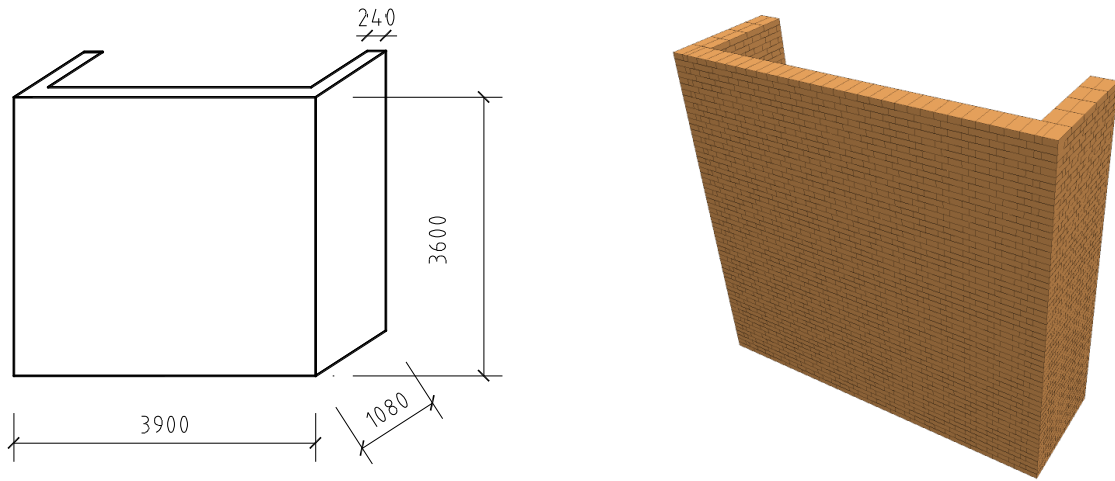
Geometry and numerical model of the masonry wall in 3DEC for out-of-plane loading
